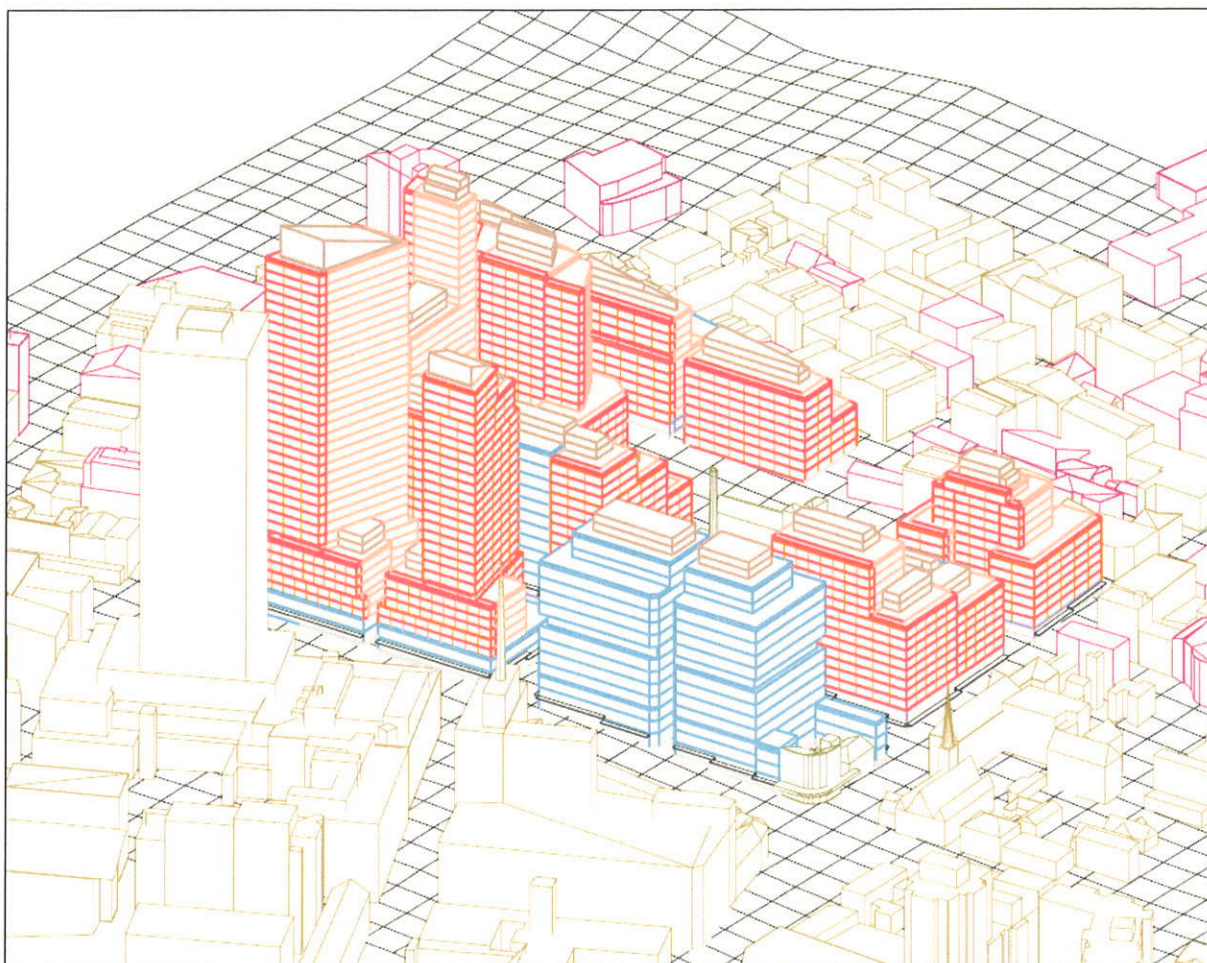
Aerial view looking south east of CUB site and building envelopes as lodged for Concept Plan. Views along Abercrombie and Broadway. Red denotes residential, blue denotes commercial.
